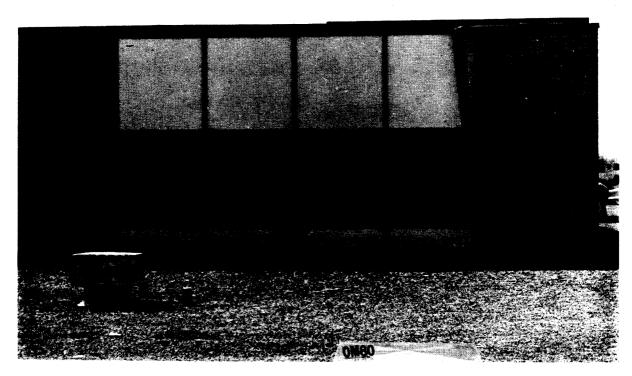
LOOSE ROOF GRAVEL PRESENTS A HAZARD TO ADJACENT GLASS WINDOWS
